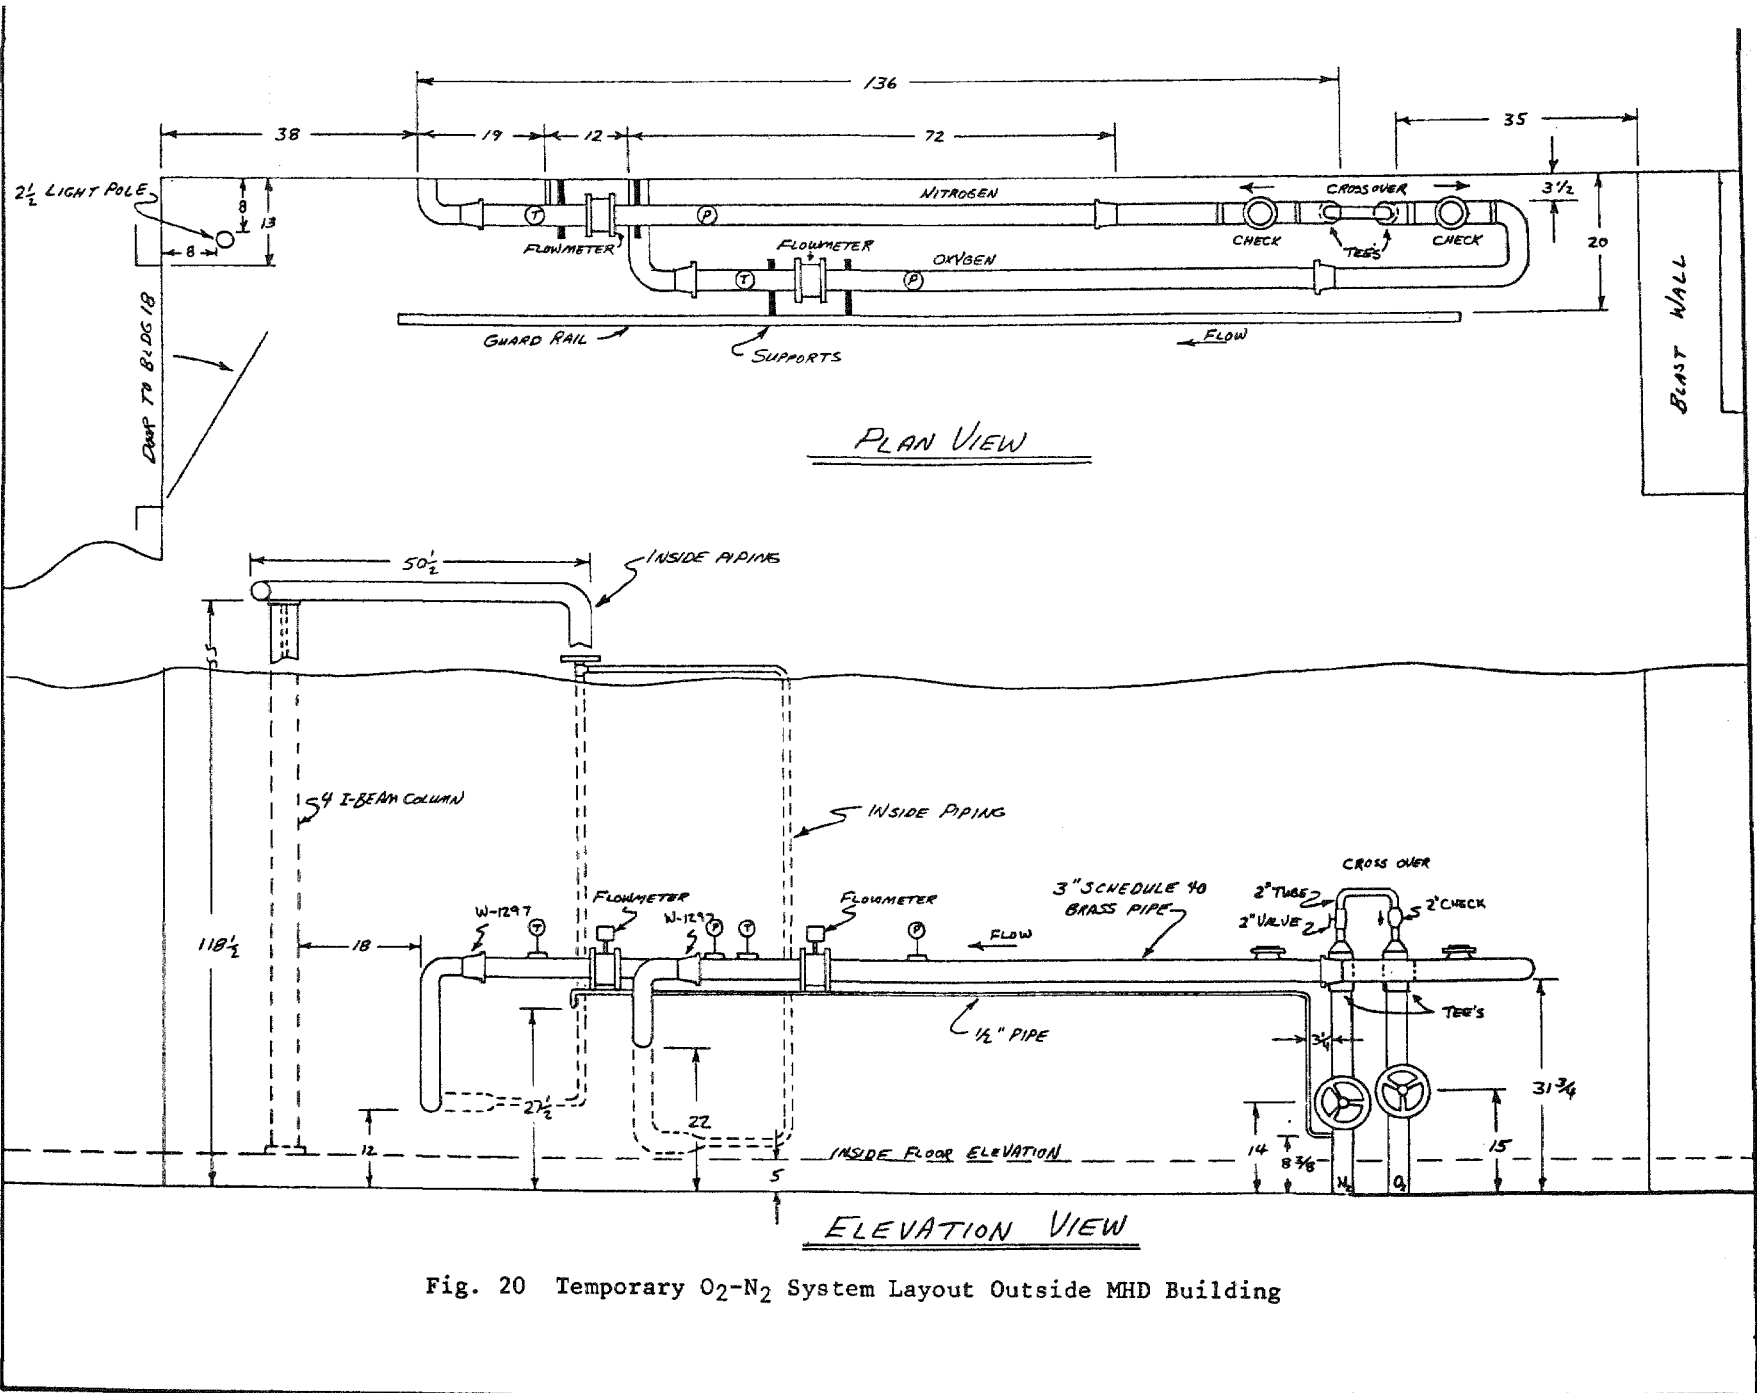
Temporary O₂-N₂ System Layout Outside MHD Building
